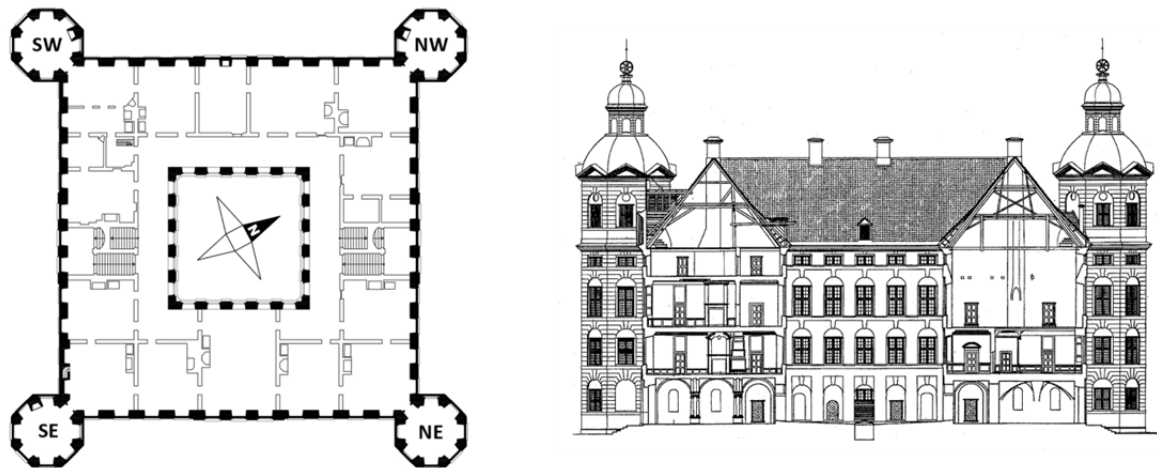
Plan for Skokloster Castle, showing its exterior symmetry, and section
